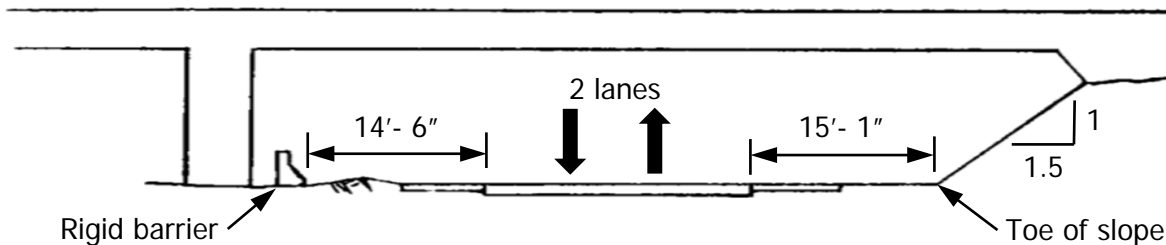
Bridge elevation view of a 2-lane, 2-way highway feature below the bridge, with a rigid barrier.
